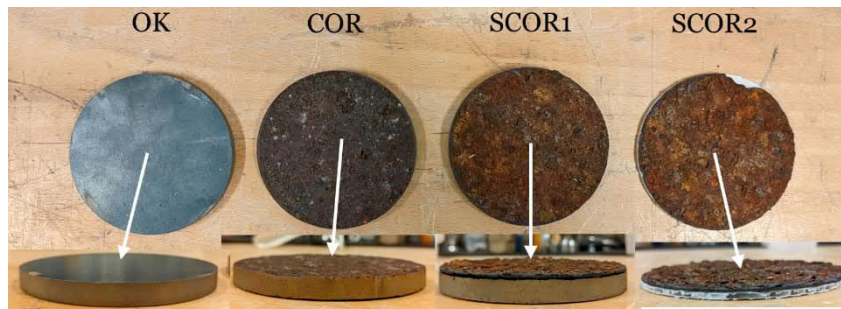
Plate discs that were embedded in concrete. OK is a plate with no known flaws. COR is a uniformly corroded plate. SCOR1 is uniformly corroded and has a thin sheet corrosion product attached to it. SCOR2 consists only of the sheet-type corrosion product.
